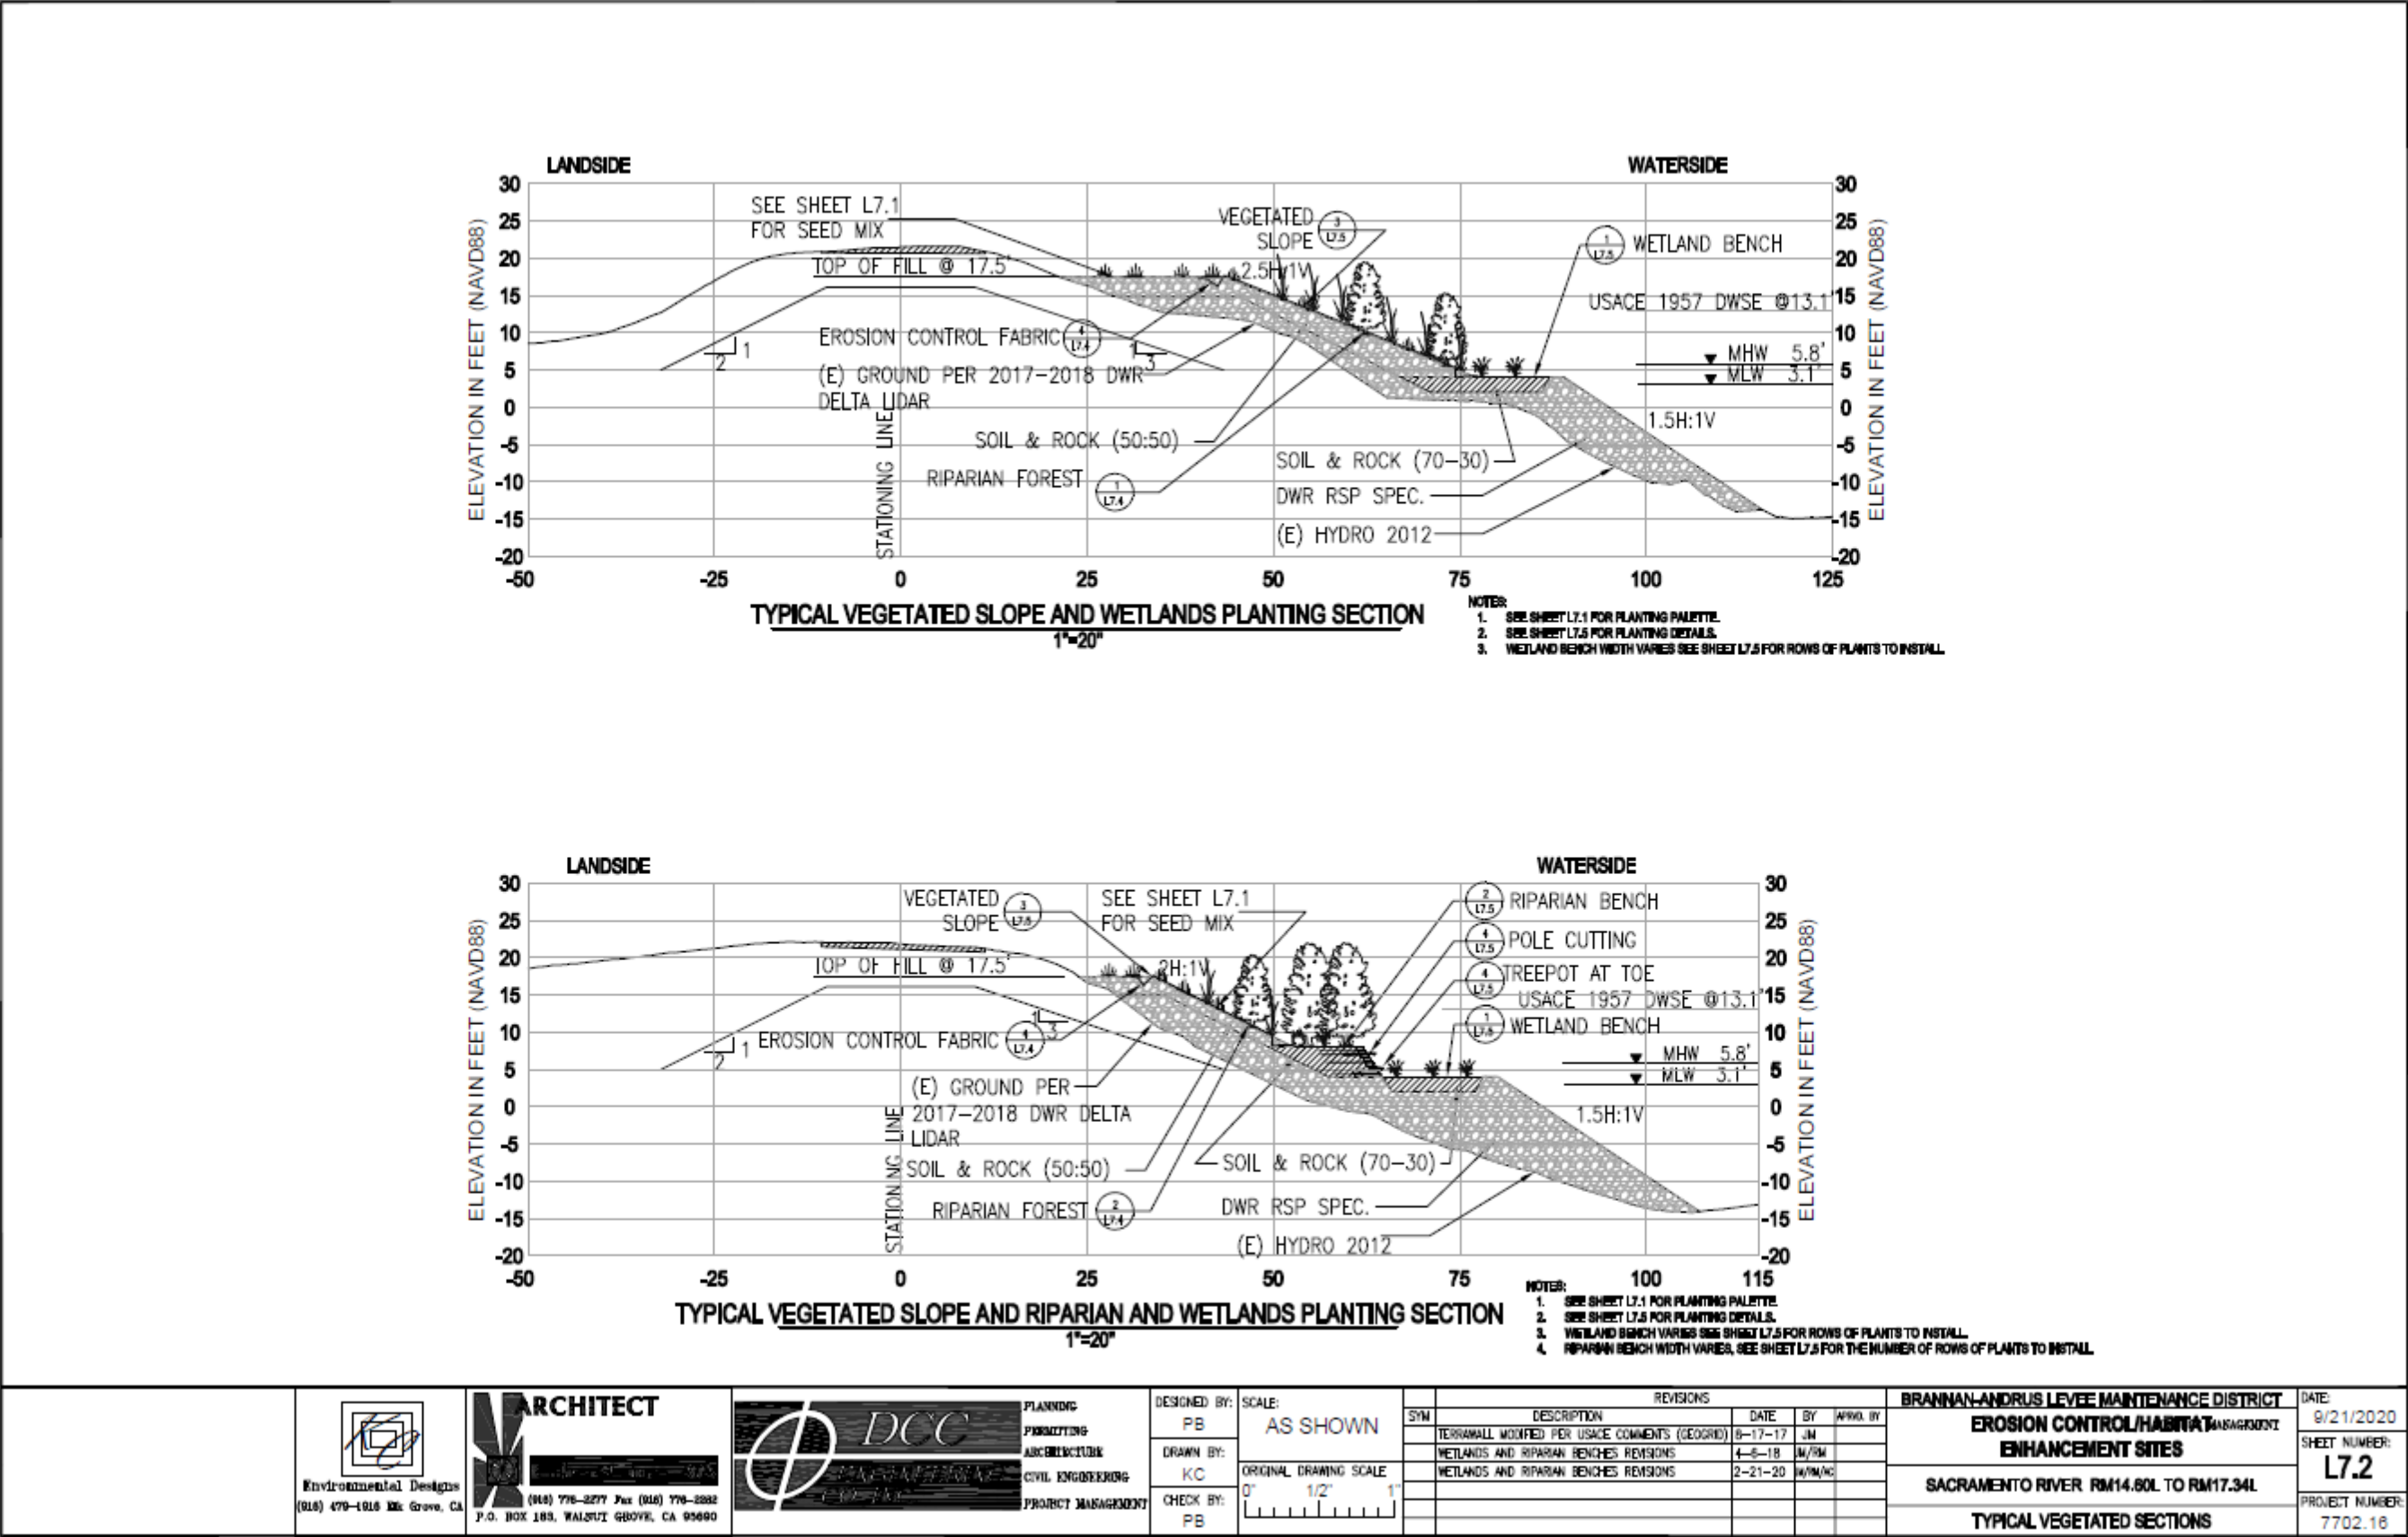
Vegetated Slope, Riparian and Freshwater Tidal Marsh Bench - Typical Planting Plan
